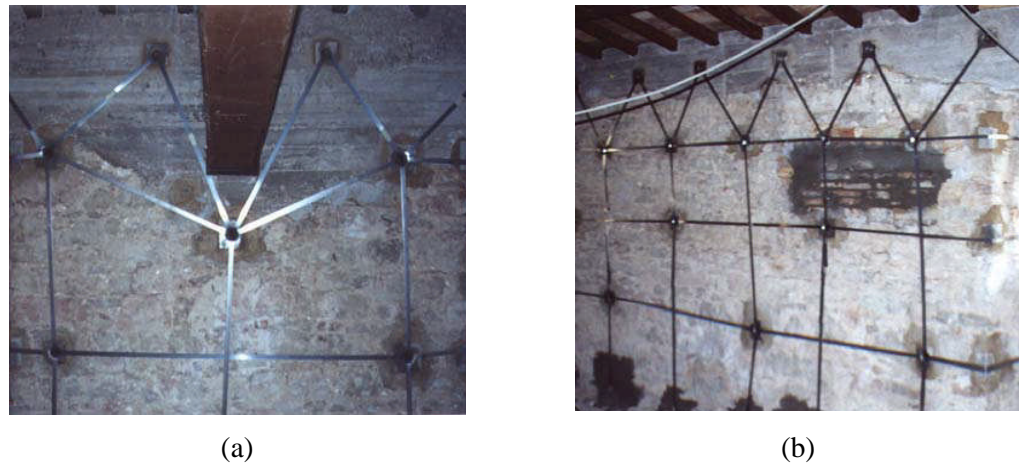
Application of CAM system: (a,b) two examples of strengthened masonry.
